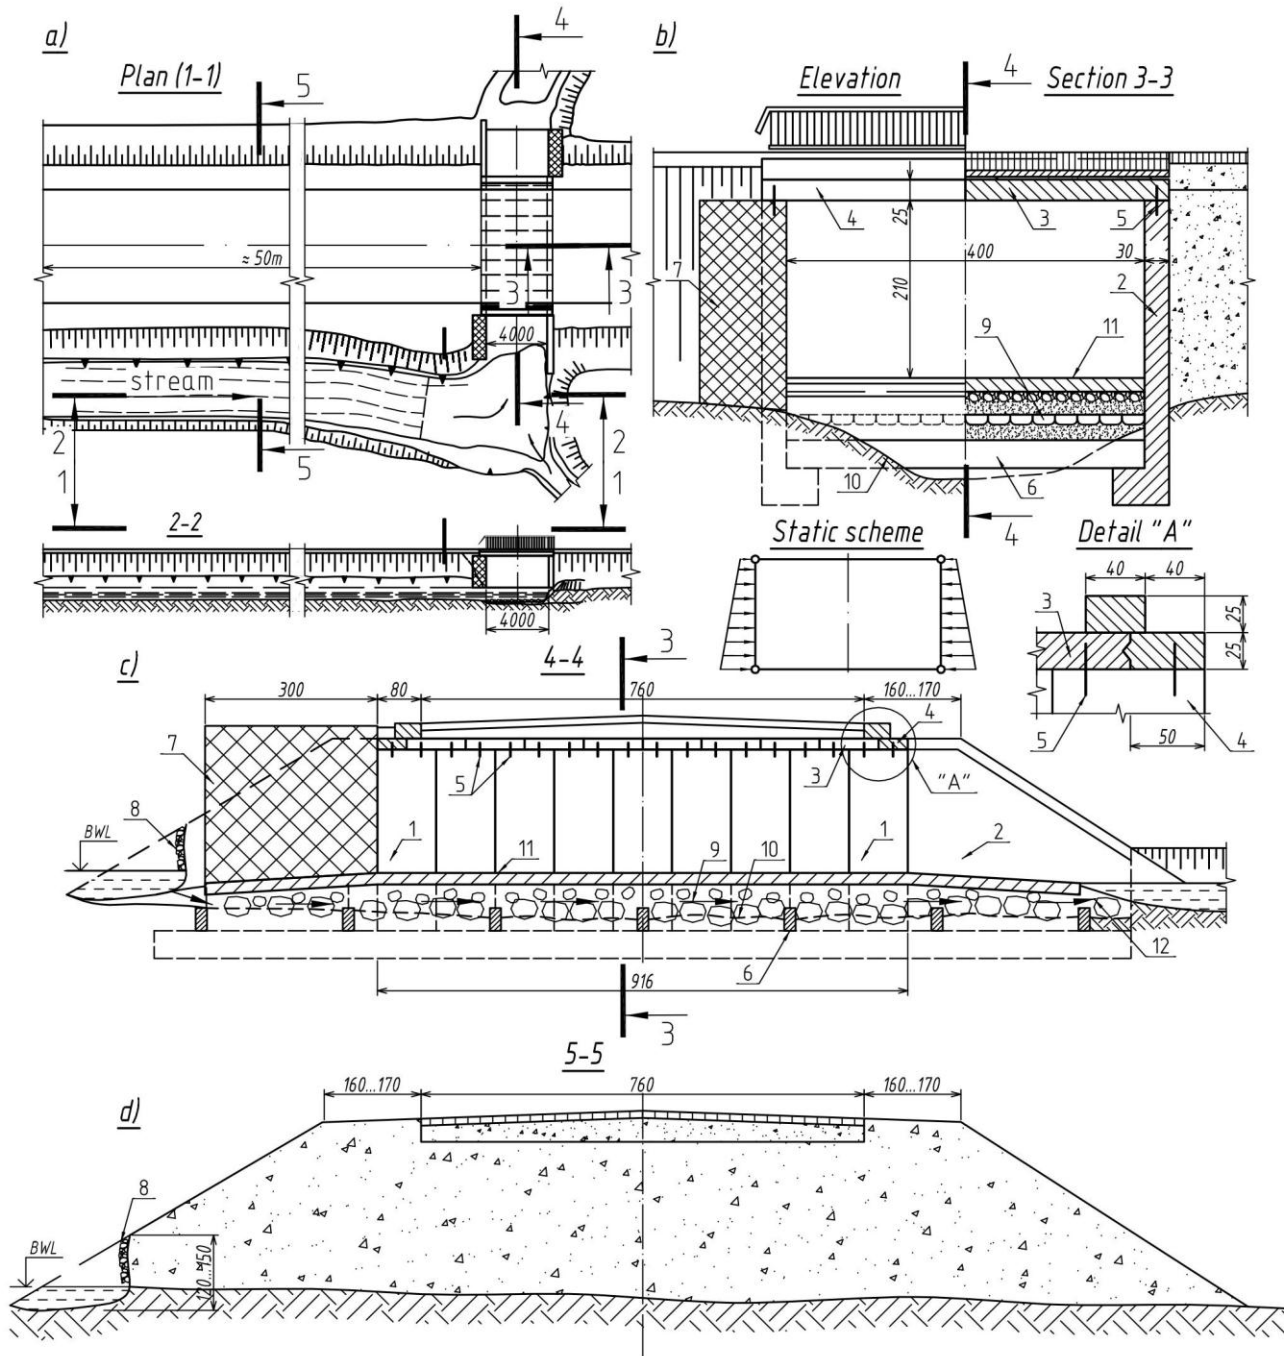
Situational layout plan (a) and construction of the present bridge (b, c, d):
